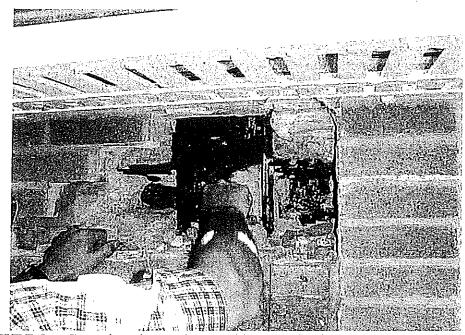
Corrosion observed on steel beam and column after removal of brick facade and concrete on beam.
